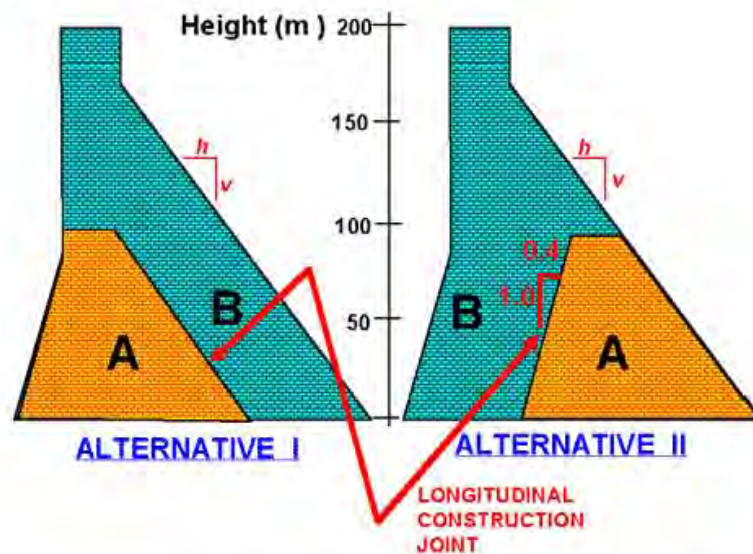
Two-stage construction of a 200-m high RCC gravity dam [4.02].
